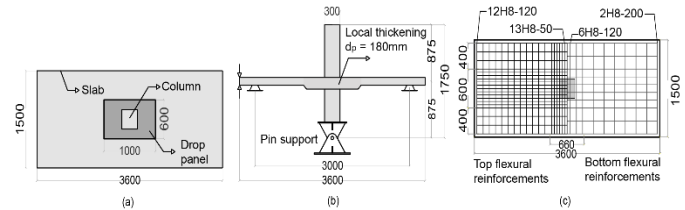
Detail of test specimen: (a) plan; (b) side view; (c) reinforcement layouts (unit in millimetre).
